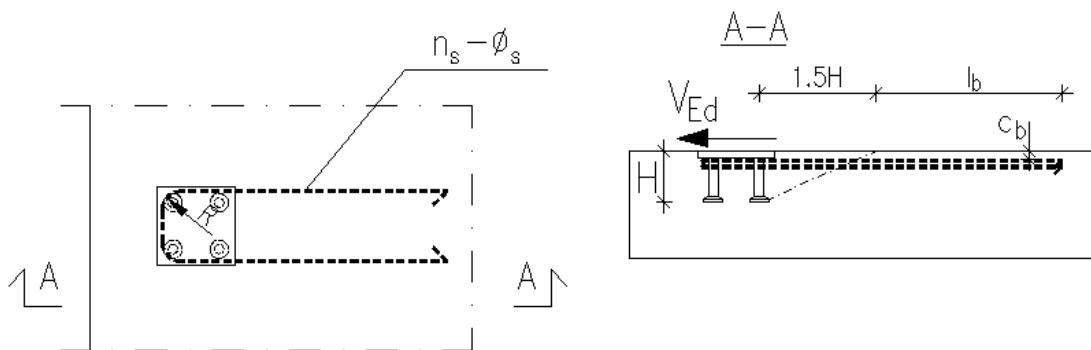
SBKL fastening plate reinforcement for shear and torsion
